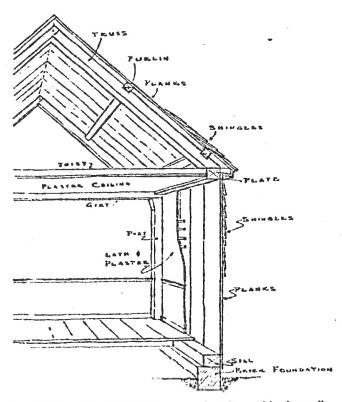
Sketch of typical plank construction observed in the traditional houses of Lower Cape Cod (author).
